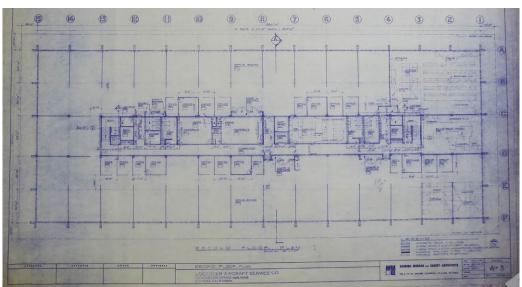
Second floor plan. Architect's drawing, 1967. Source: LAWA records.
